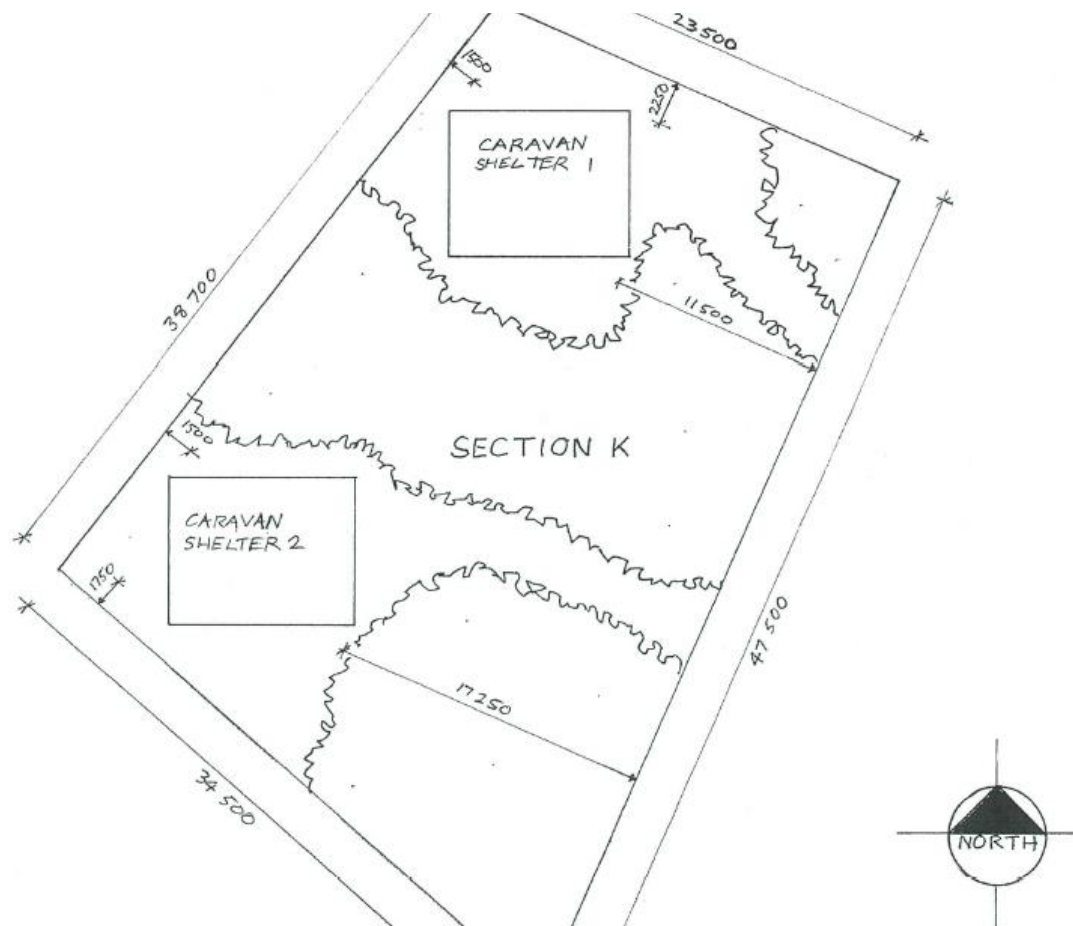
site plan showing the tow proposed caravan shelters within the relocated Lot K
